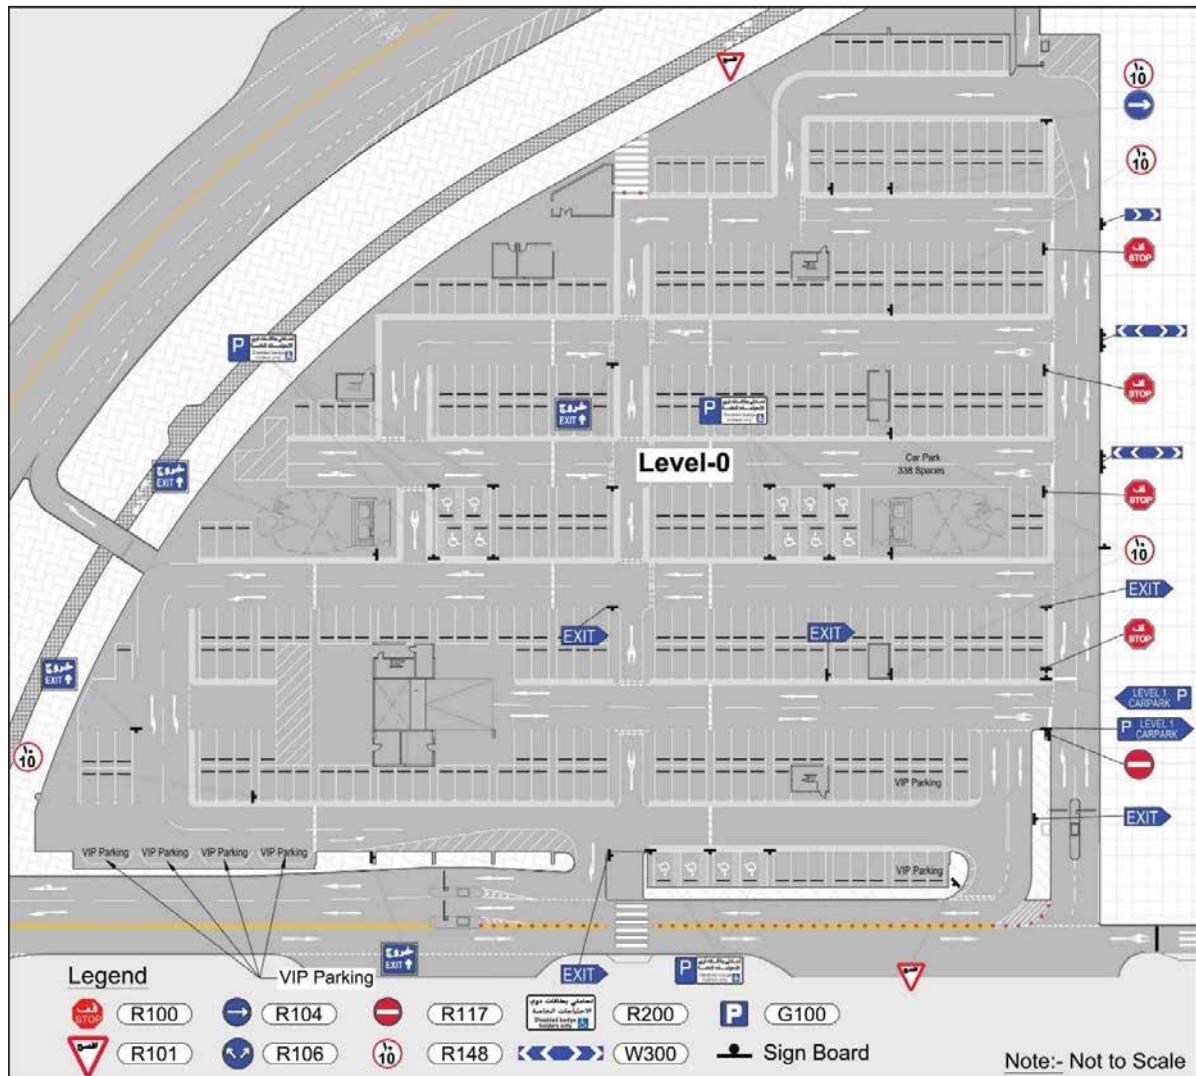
Typical Multilevel Car Parking Facility Layout
